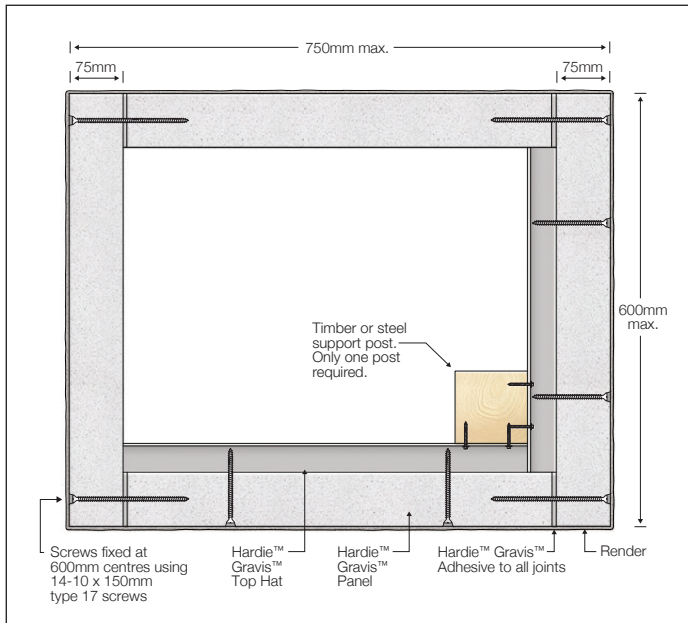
COLUMN DETAIL - GLUED AND SCREWED
